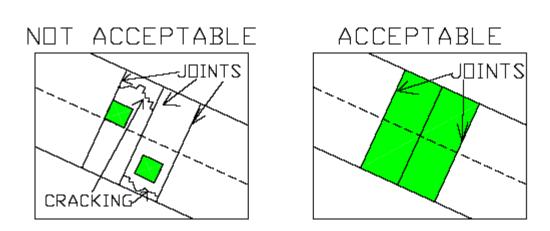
Example 4: In concrete pavements, remove sections to existing joints.
